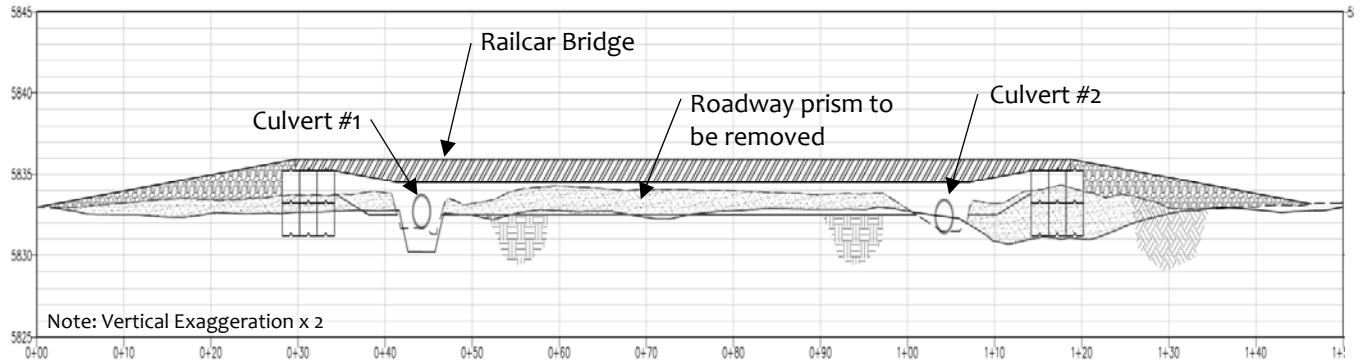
Culvert Replacement Alternative 3 – Full Span Bridge
